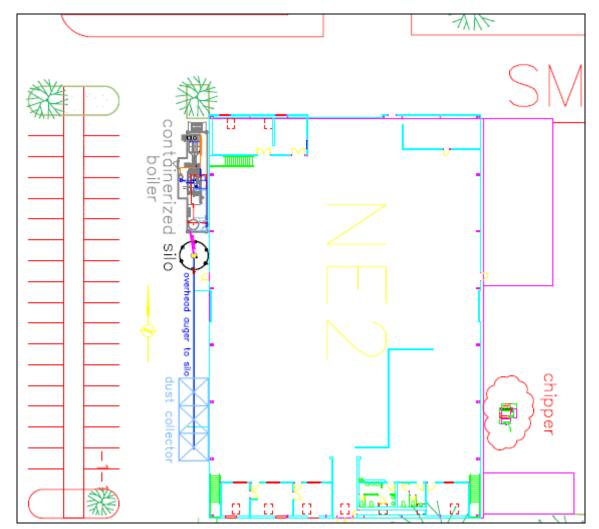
Potential location of a biomass heating plant along the west side of the joinery workshop where the hopper for the central dust collection system is located.
